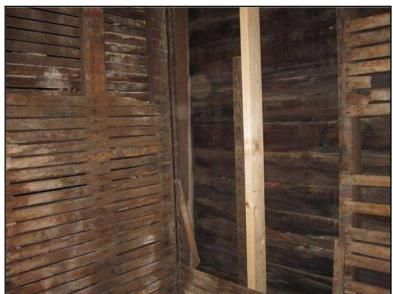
Clapboard installed without sheathing, room 207, southwest (courtesy of Adam Archual)
